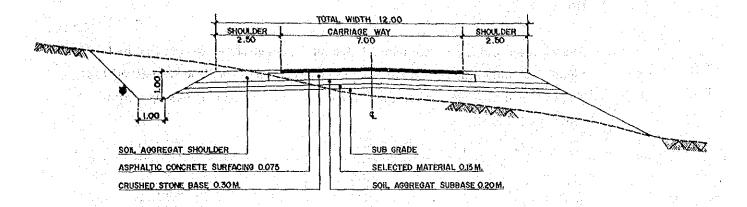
TYPICAL CROSS SECTION FOR TWO LANE ROAD
